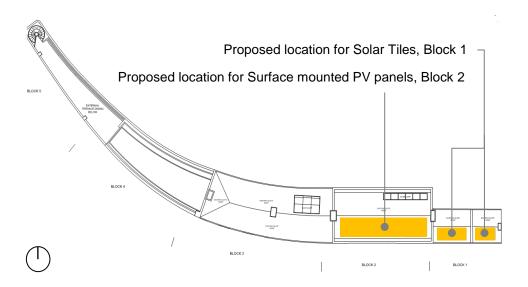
Proposed roof plan for the Fish & Coal Offices showing the proposed location for photovoltaic panels
